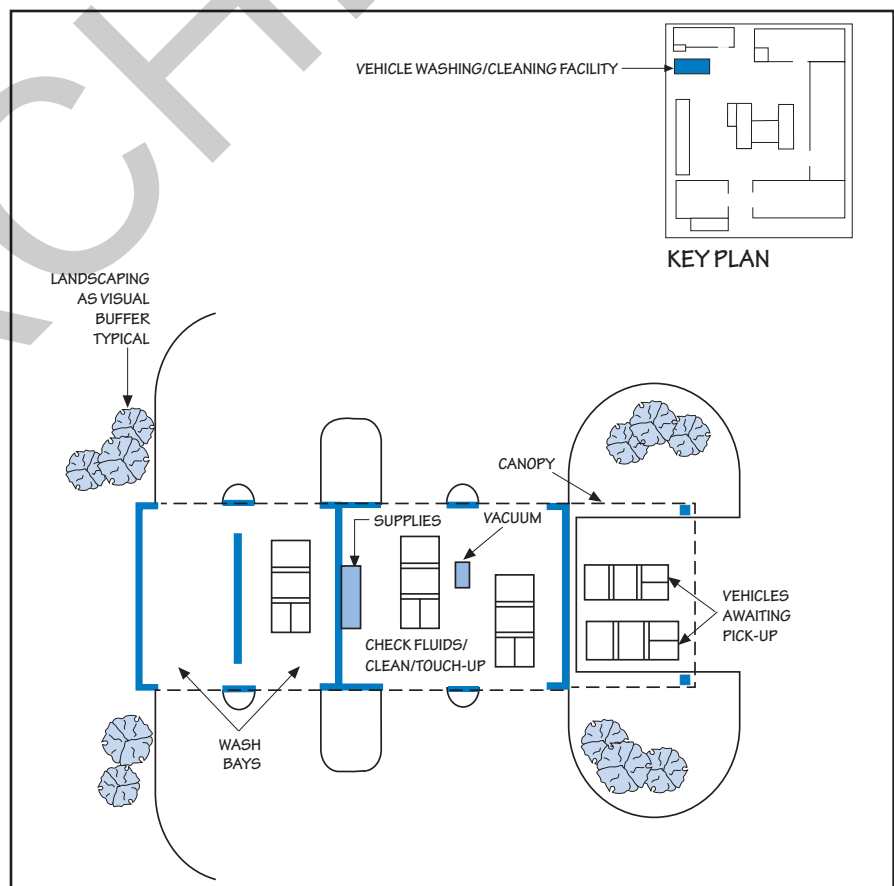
B: Illustrative Floor Plan for the Vehicle Washing/Cleaning Facility.
